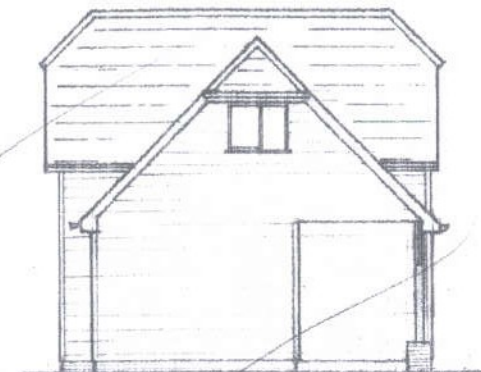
DETAIL OF STABLES WITH ANCILLARY FACILITIES.
